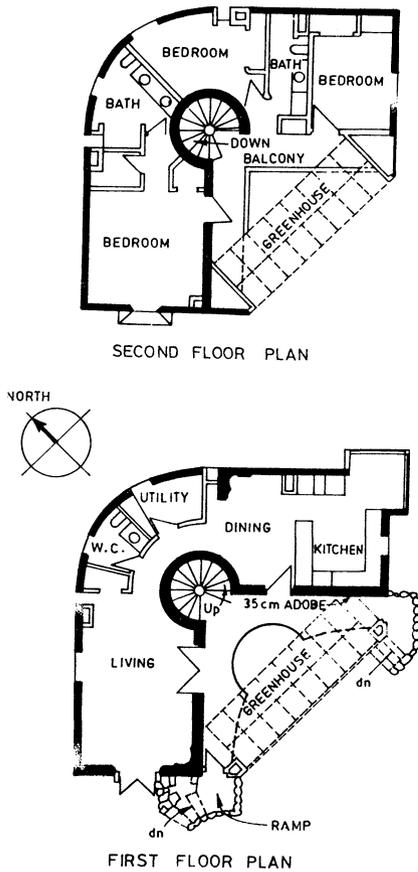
FLOOR-PLANS OF BALCOMB HOUSE (From SANDIA[29,])
